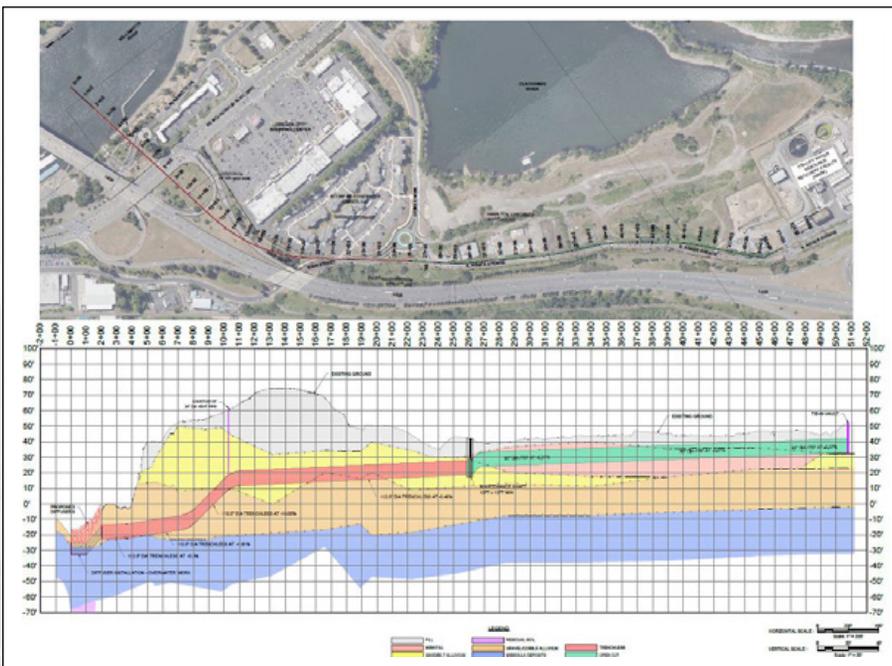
Plan and Longitudinal Geotechnical Section of the Tri-City Outfall Alignment
